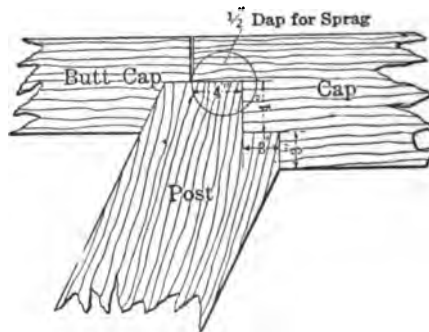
DRIFT SET FOR HEAVY GROUND.
